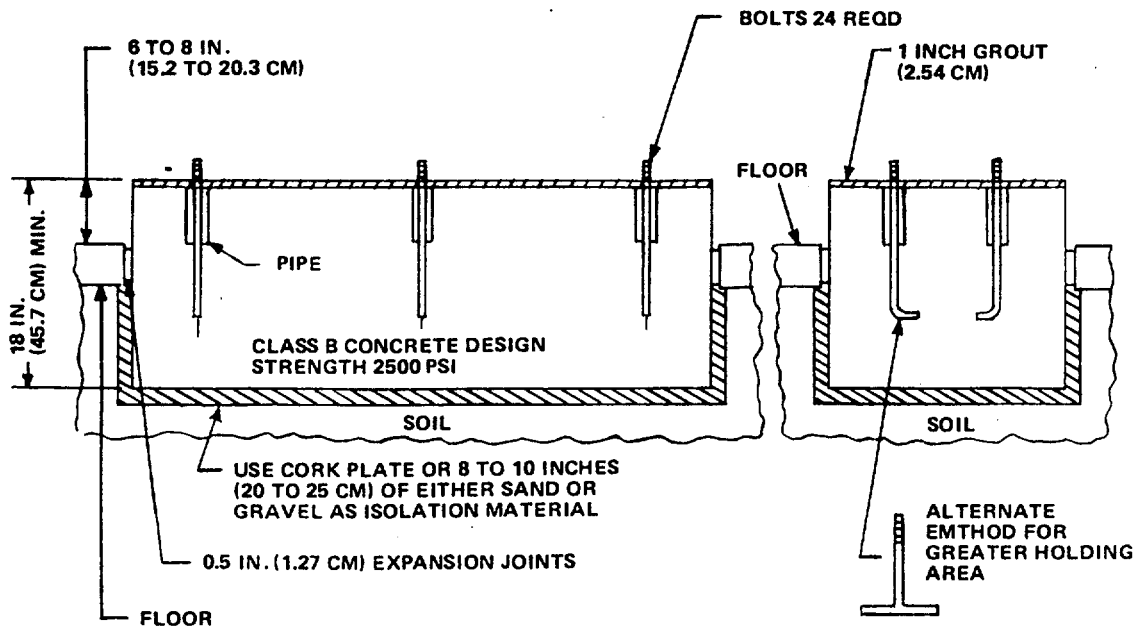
Cross Section View of Pad and Mounting Bolt Installation
